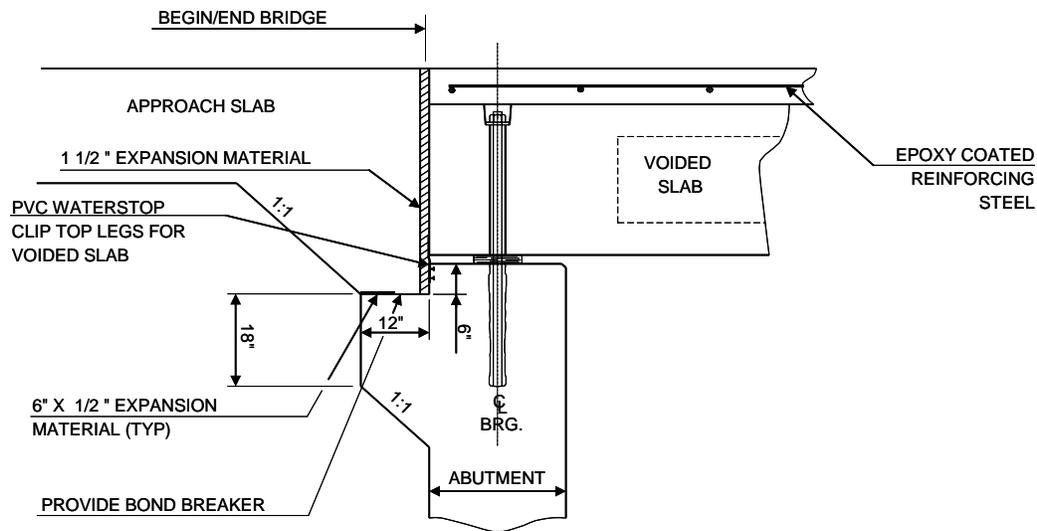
2 Voided Slab Type C Bridge End Detail
